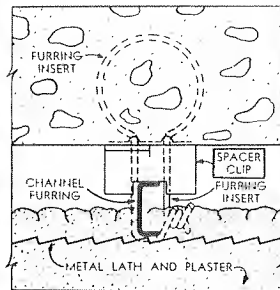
Furring Insert and Spacer (Patented) for Concrete and Unit Masonry Walls.
